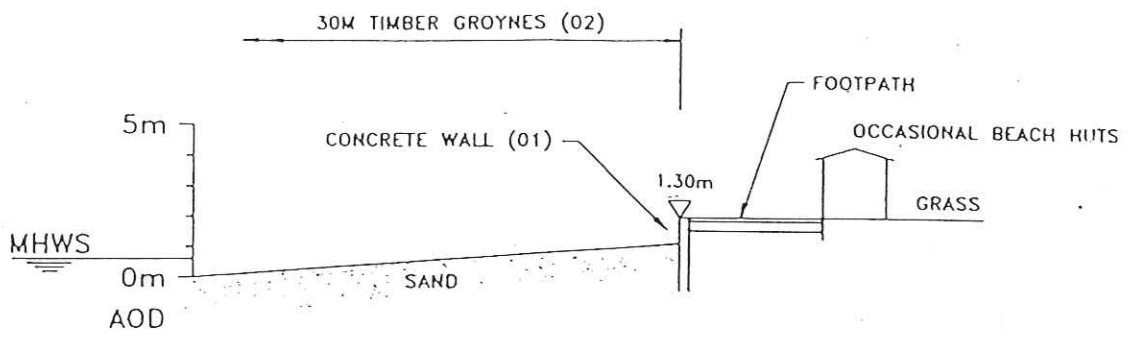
Seawall cross-sections 13/2 and 13/4
